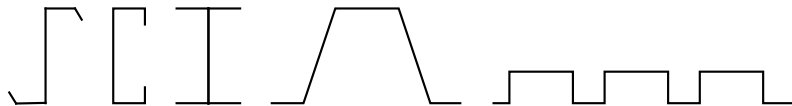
Common Cold Formed Steel Section Geometries
